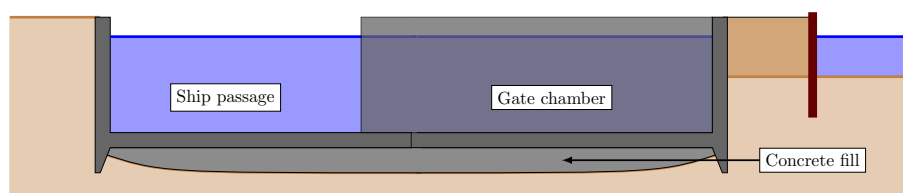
Step 5 - Filling the working chamber with concrete and completion of the lock head
